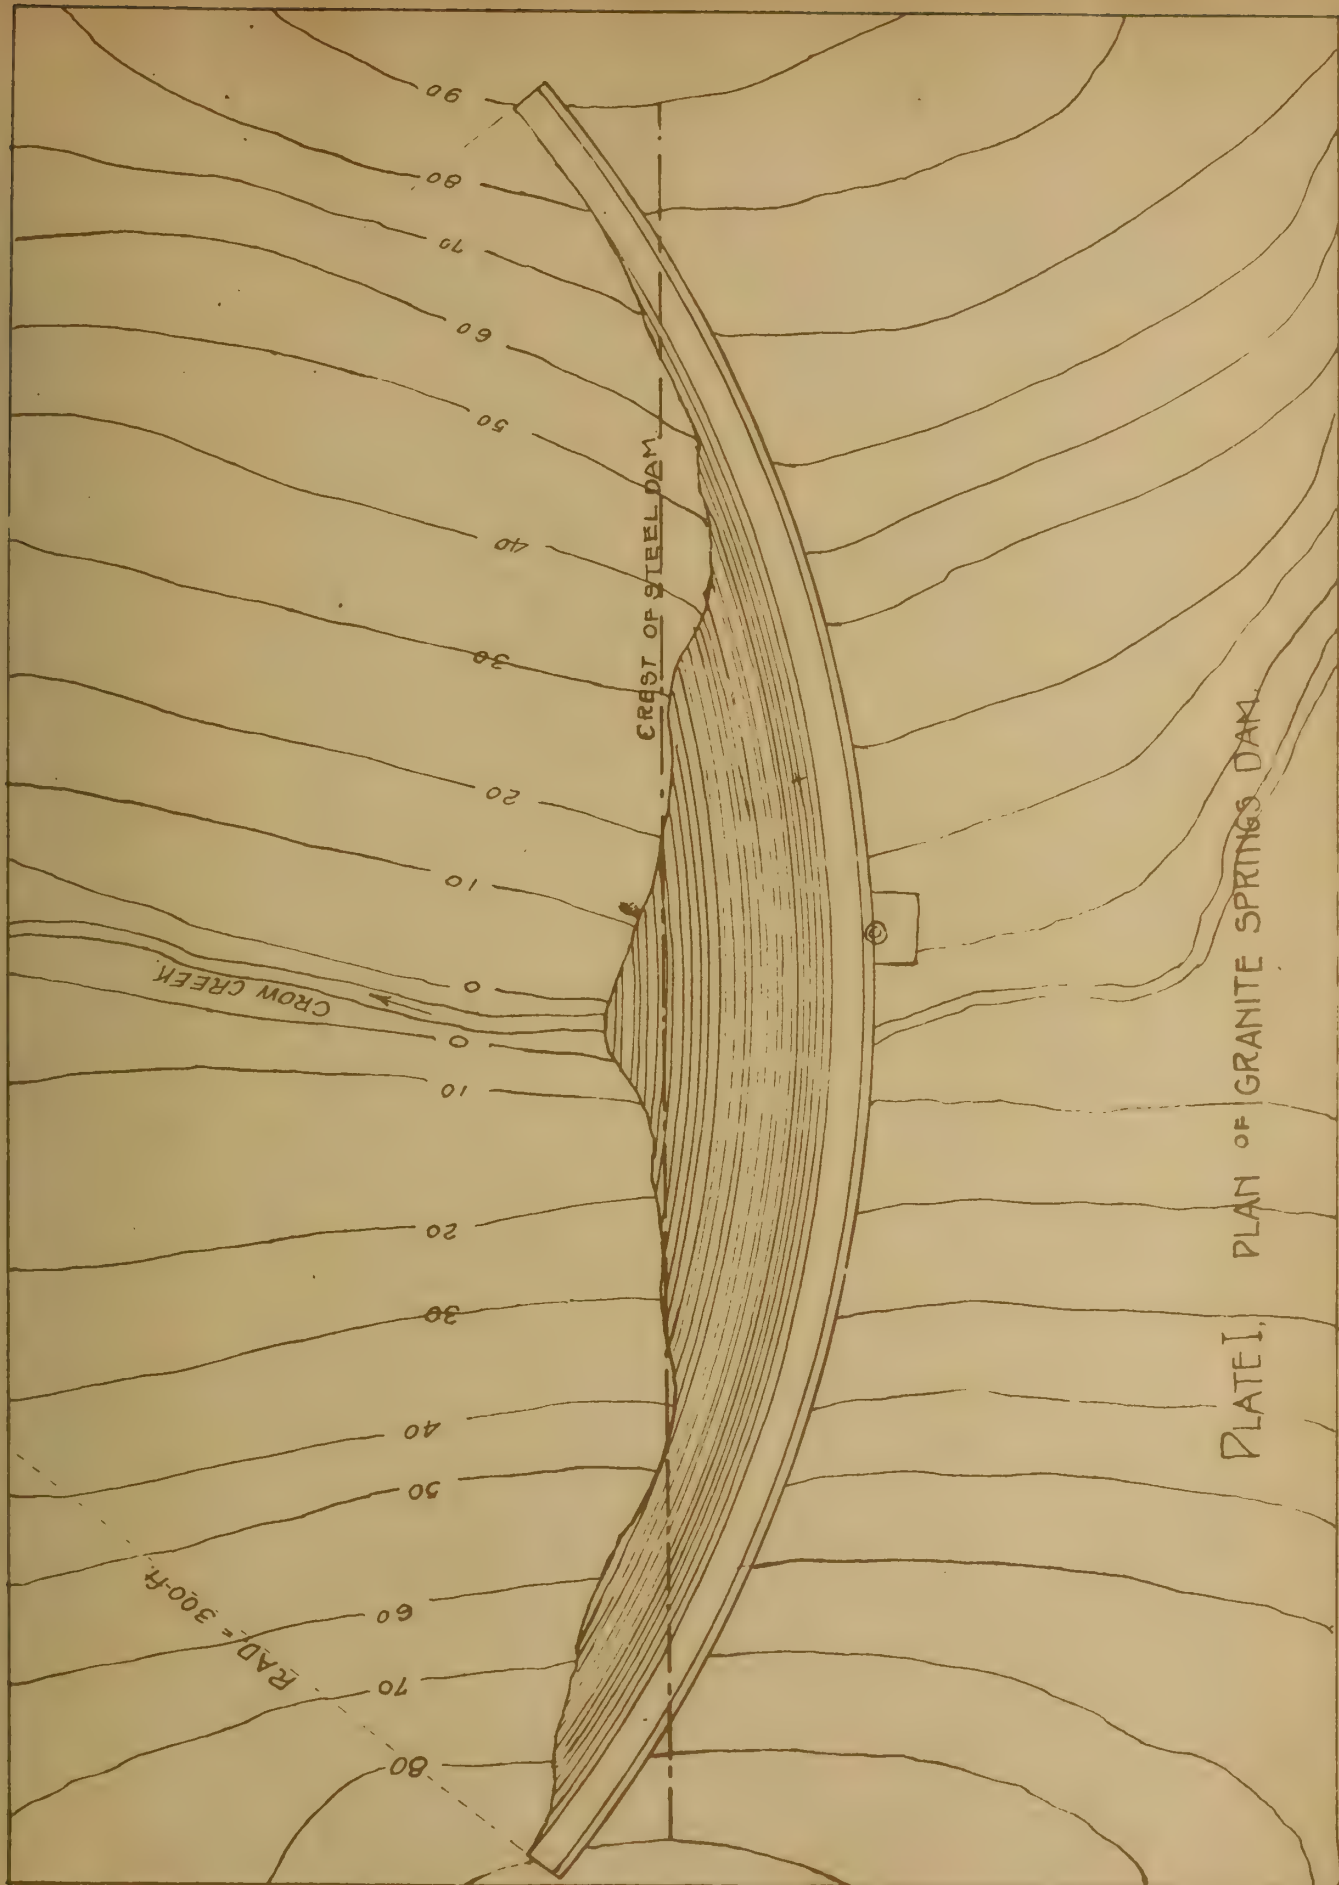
PLATE I, PLAN OF GRANITE SPRINGS DAM.
